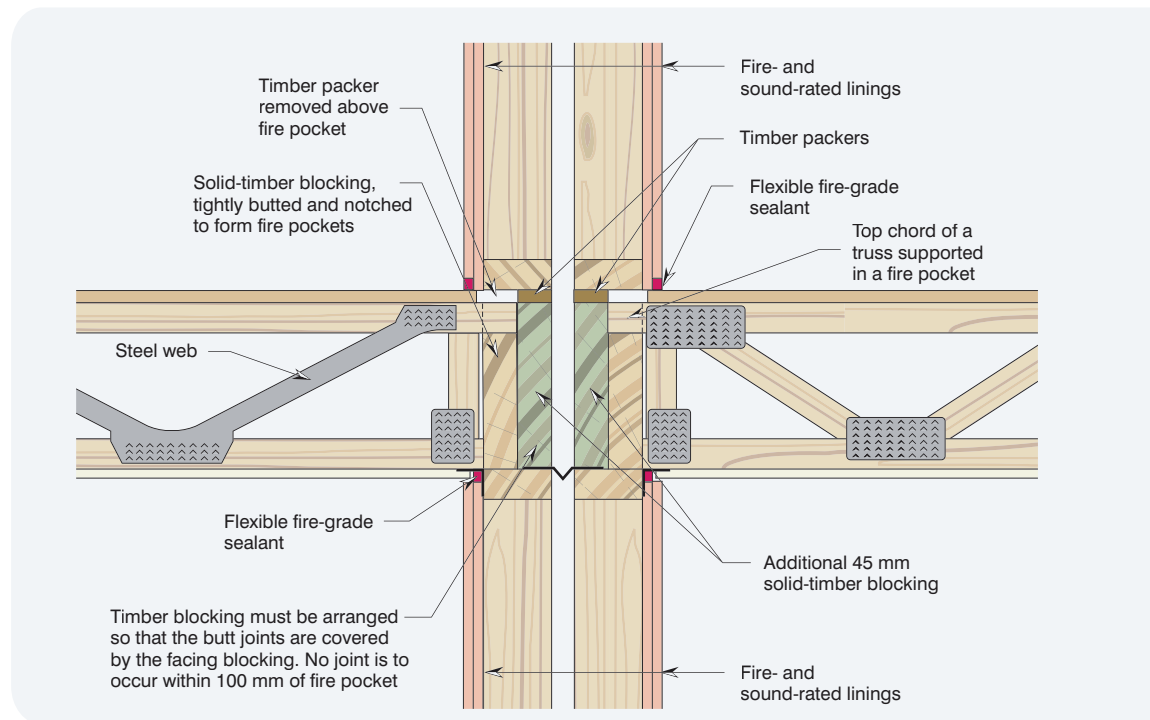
Floor-truss top chord supported in pocket – FRL 60 minutes – elevation view.
